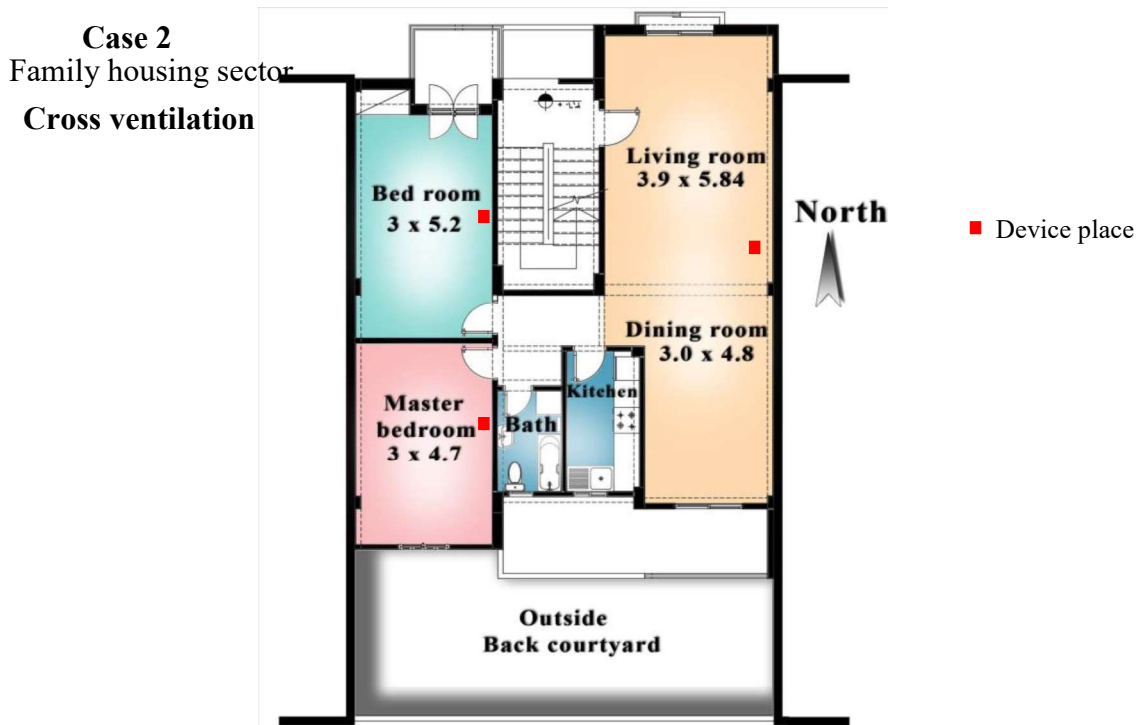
The plan for the second floor of the house, case 2 [22, Author].
